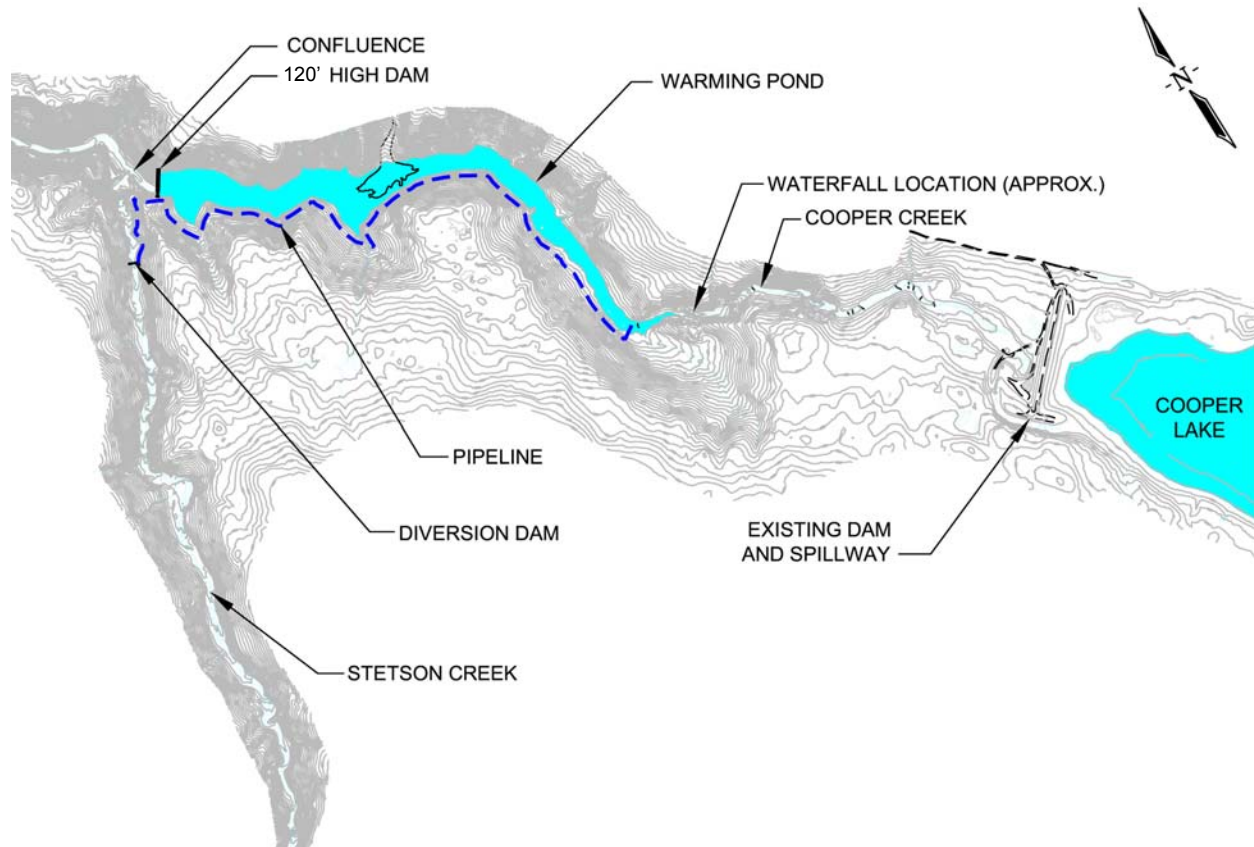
Plan of Stetson Creek Diversion, Pipeline and Warming Pond
